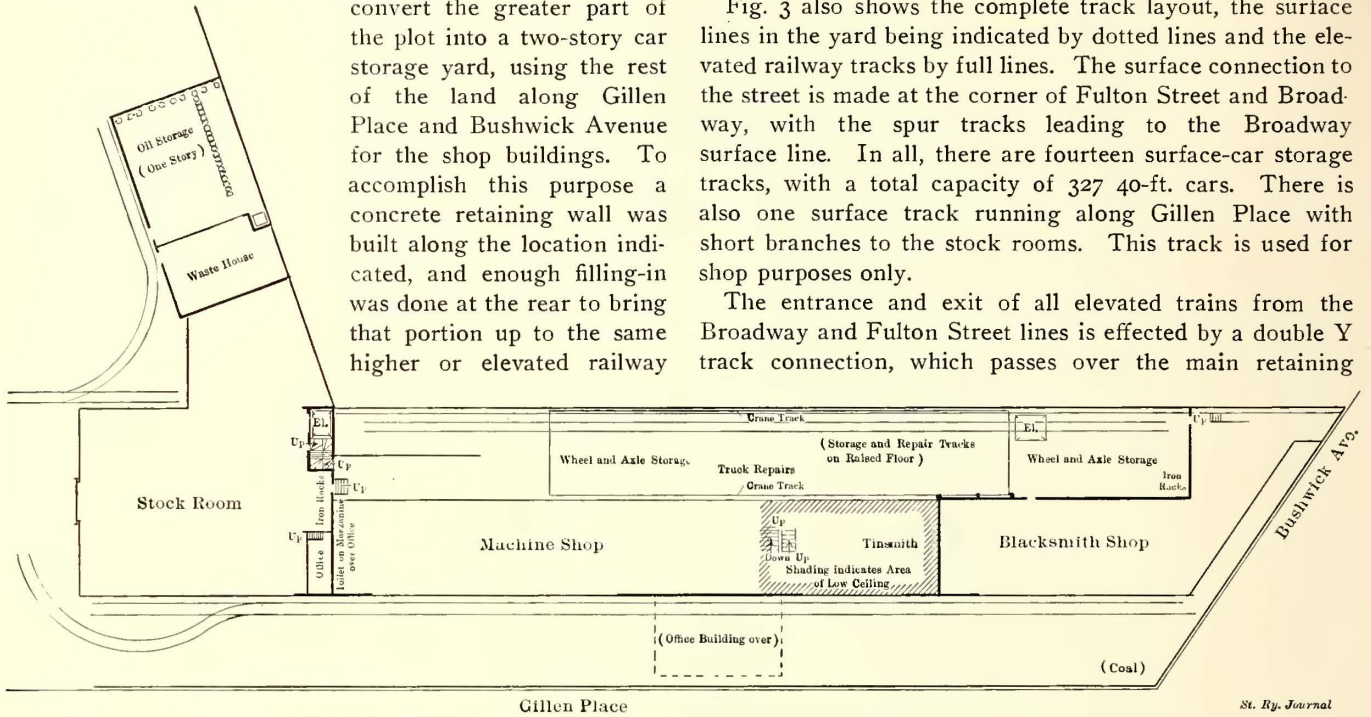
LAYOUT OF FIRST FLOOR OF MAIN SHOP BUILDING AND STORAGE HOUSES, SHOWING THE LOCATION OF THE DEPARTMENTS, SURFACE SUPPLY TRACK, ETC.
